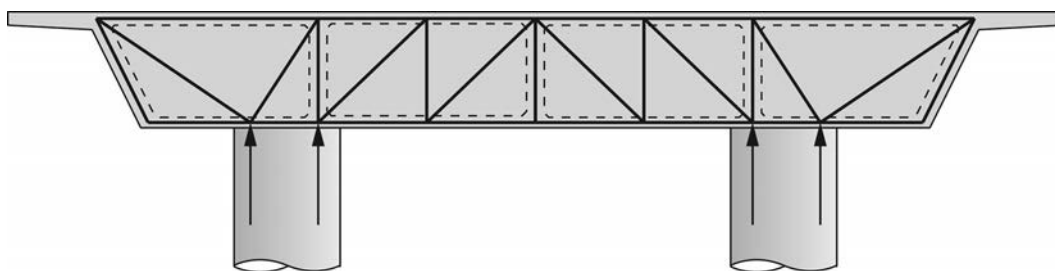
Strut-and-Tie Layout Considering Monolithic Column Connection
